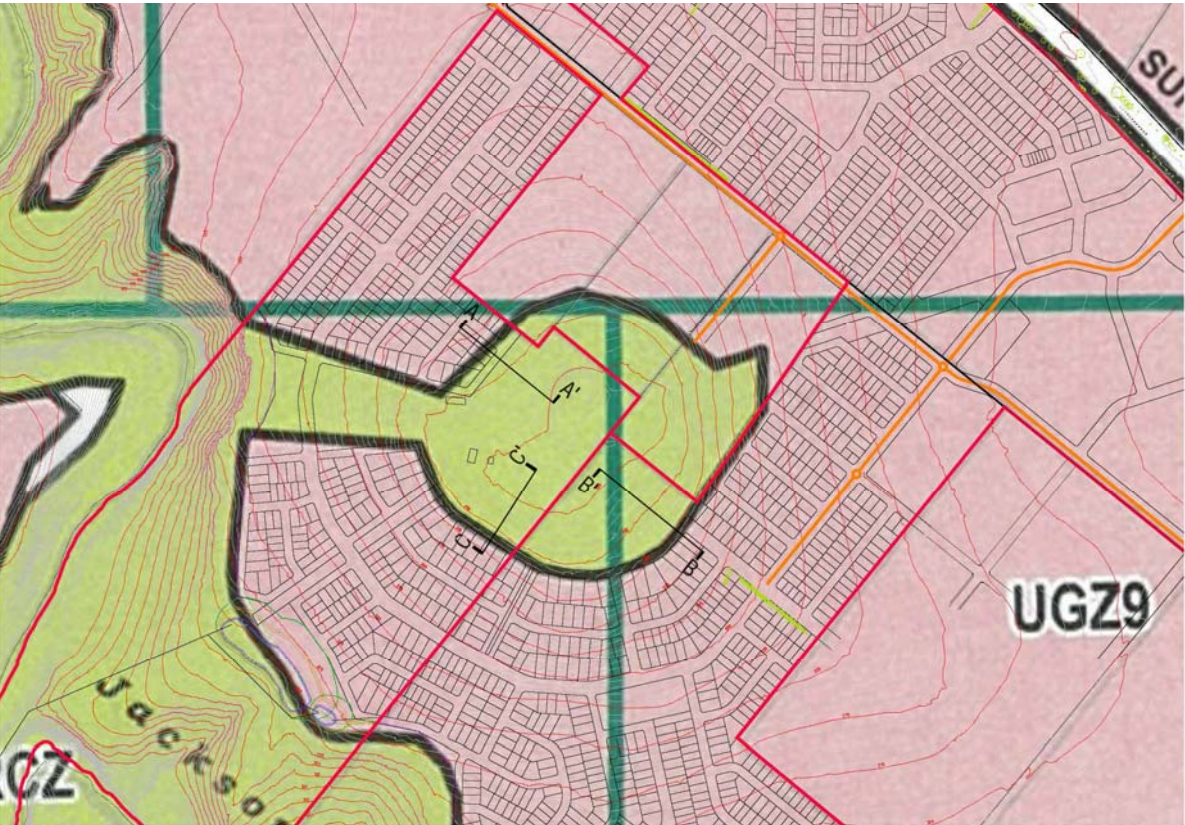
PSP zoning plan overlaid on an indicative subdivision layout provided by Villawood. (Note minor areas of discordance in the north west of the Redstone Hill park.)
